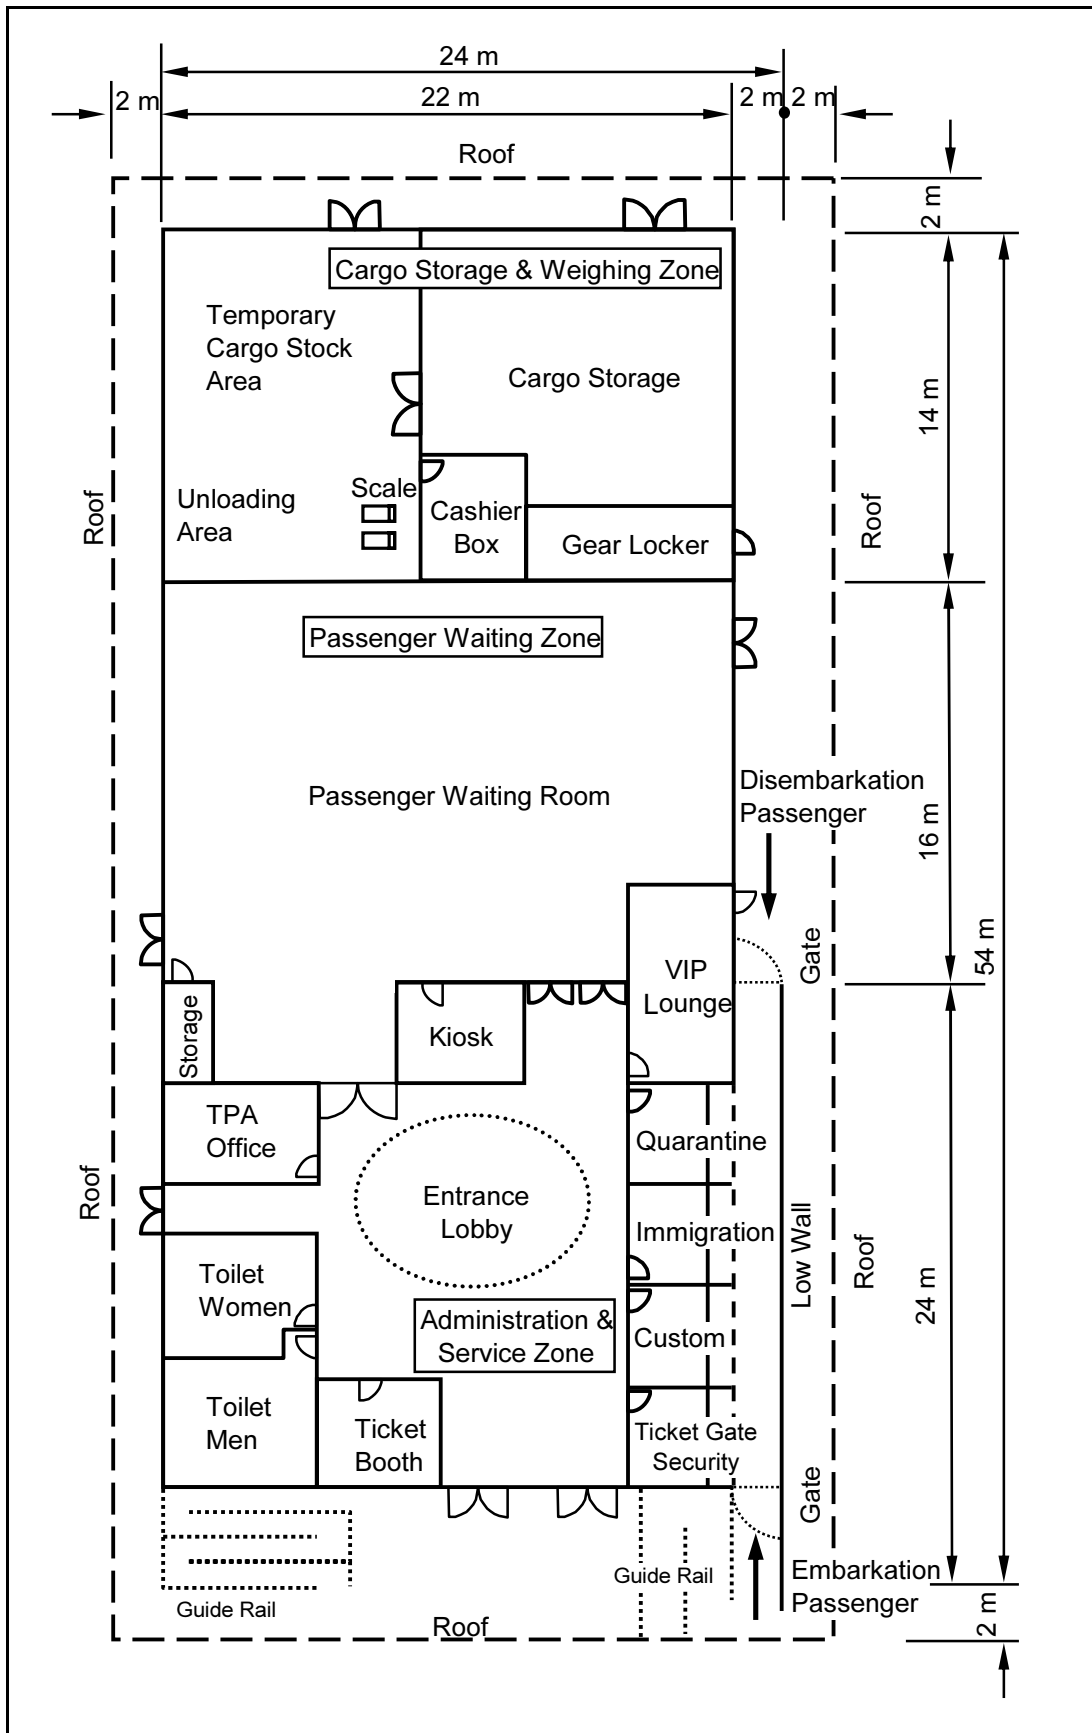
Layout Plan of Passenger Terminal Building
